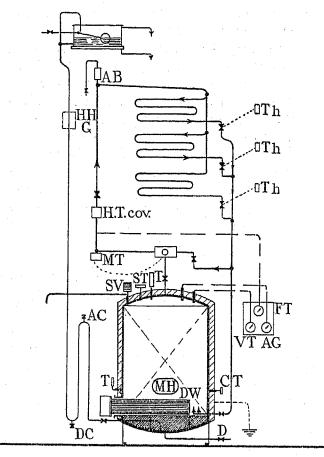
General arrangement of pipework to immersionheater type thermal-storage plant.
